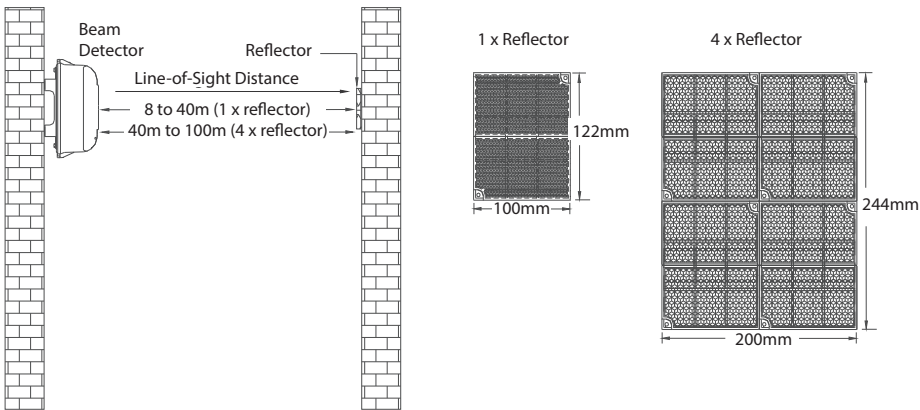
Mounting of EF-CBD130-R Reflector Reflector
